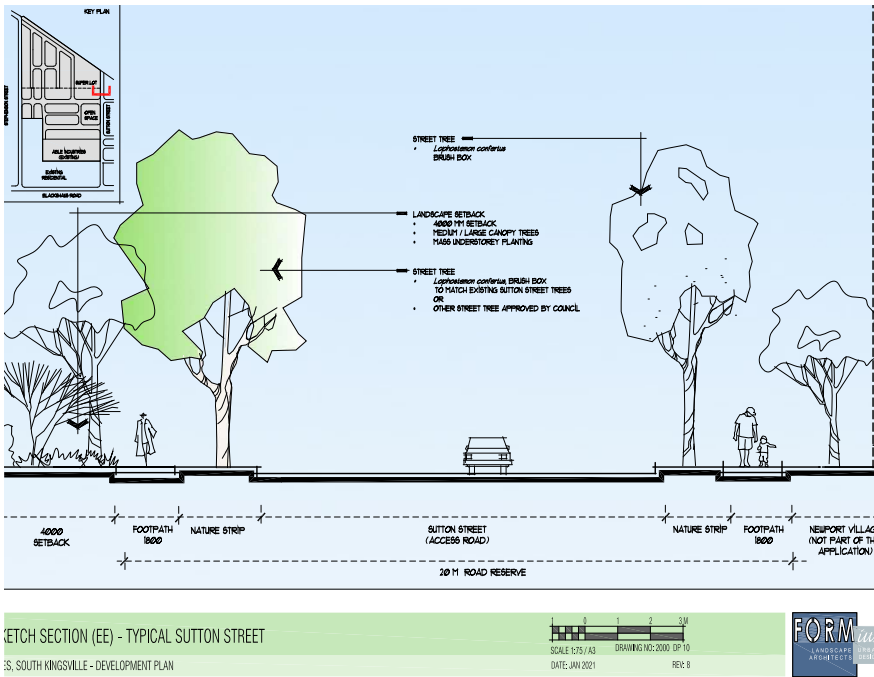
Indicative Typical Sutton Street Section (Source: Formium)
